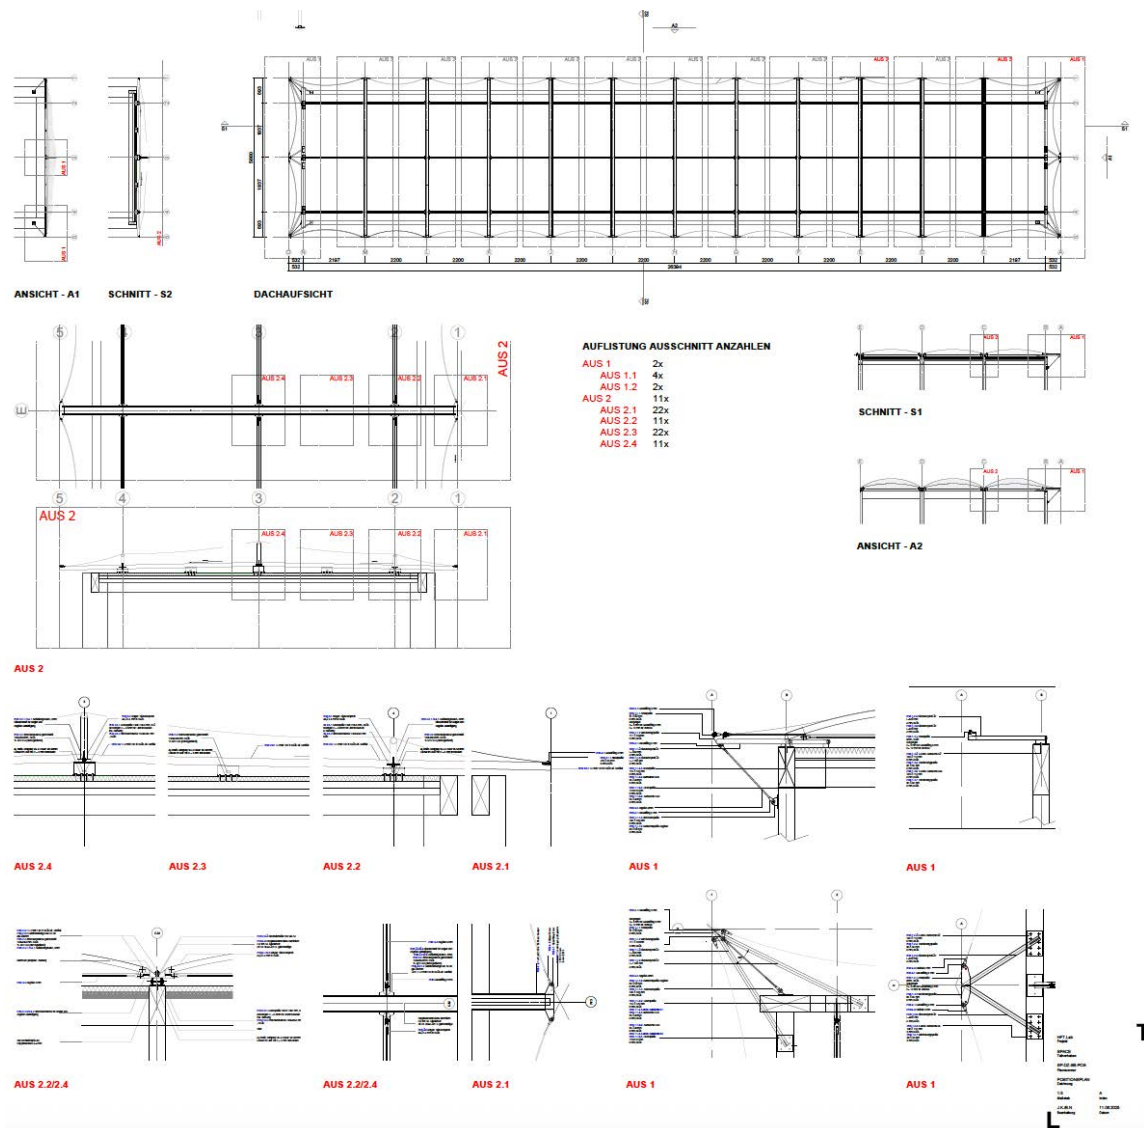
Steel parts, position plan and details, source: HFT Stuttgart.
